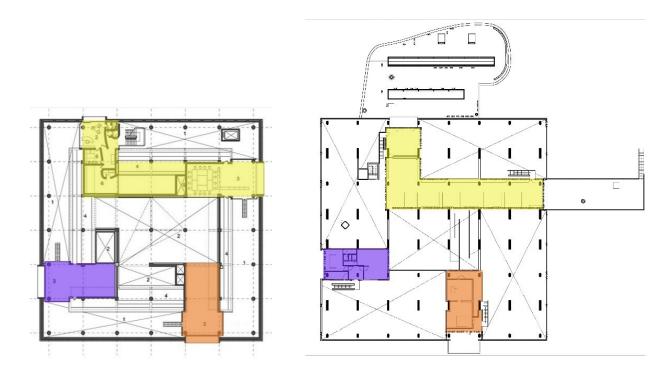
Second floor plan with half height spaces. (L) NMWA Tokyo, (R) GMAG Chandīgarh. Source: DRONAH
